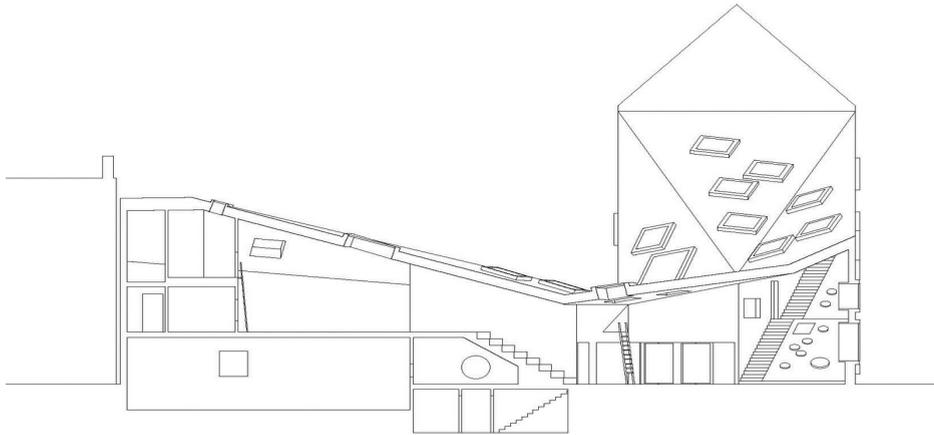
| Building Section | | Dorte Mandrup Arkitekter
